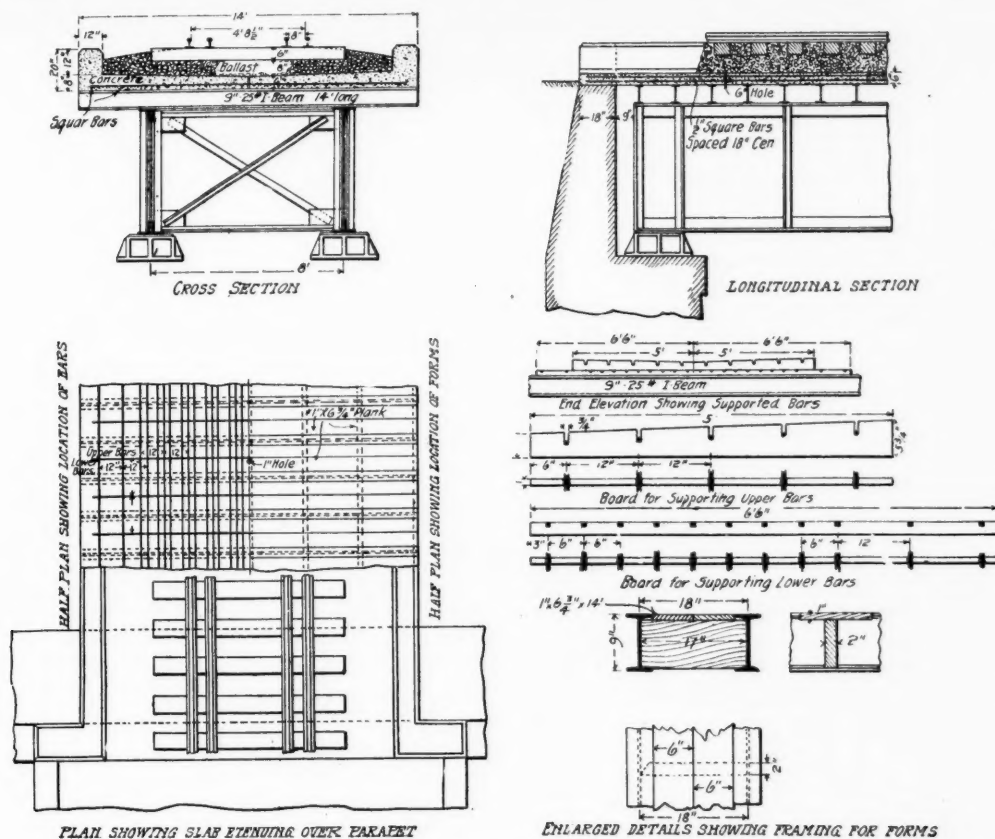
STANDARD REINFORCED CONCRETE FLOOR FOR DECK GIRDERS, WABASH R. R.
